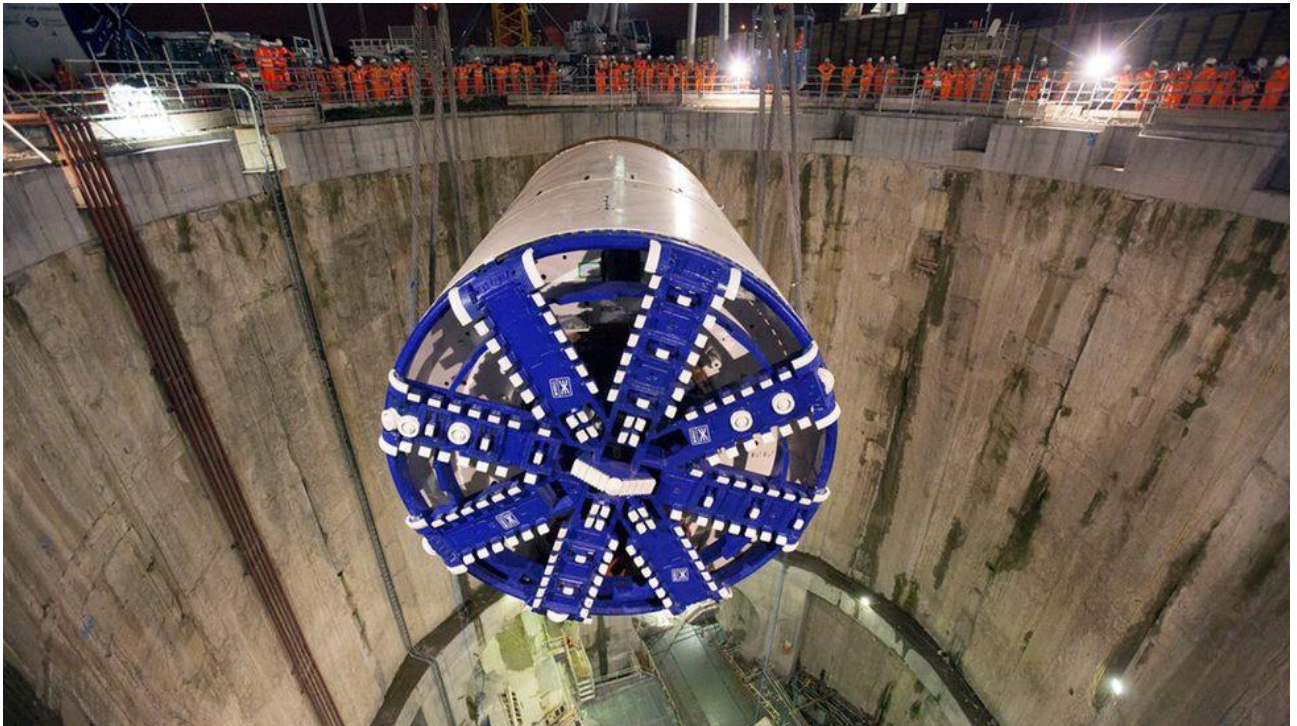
A Crossrail TBM is lowered into the London Underground system to begin drilling © Crossrail
